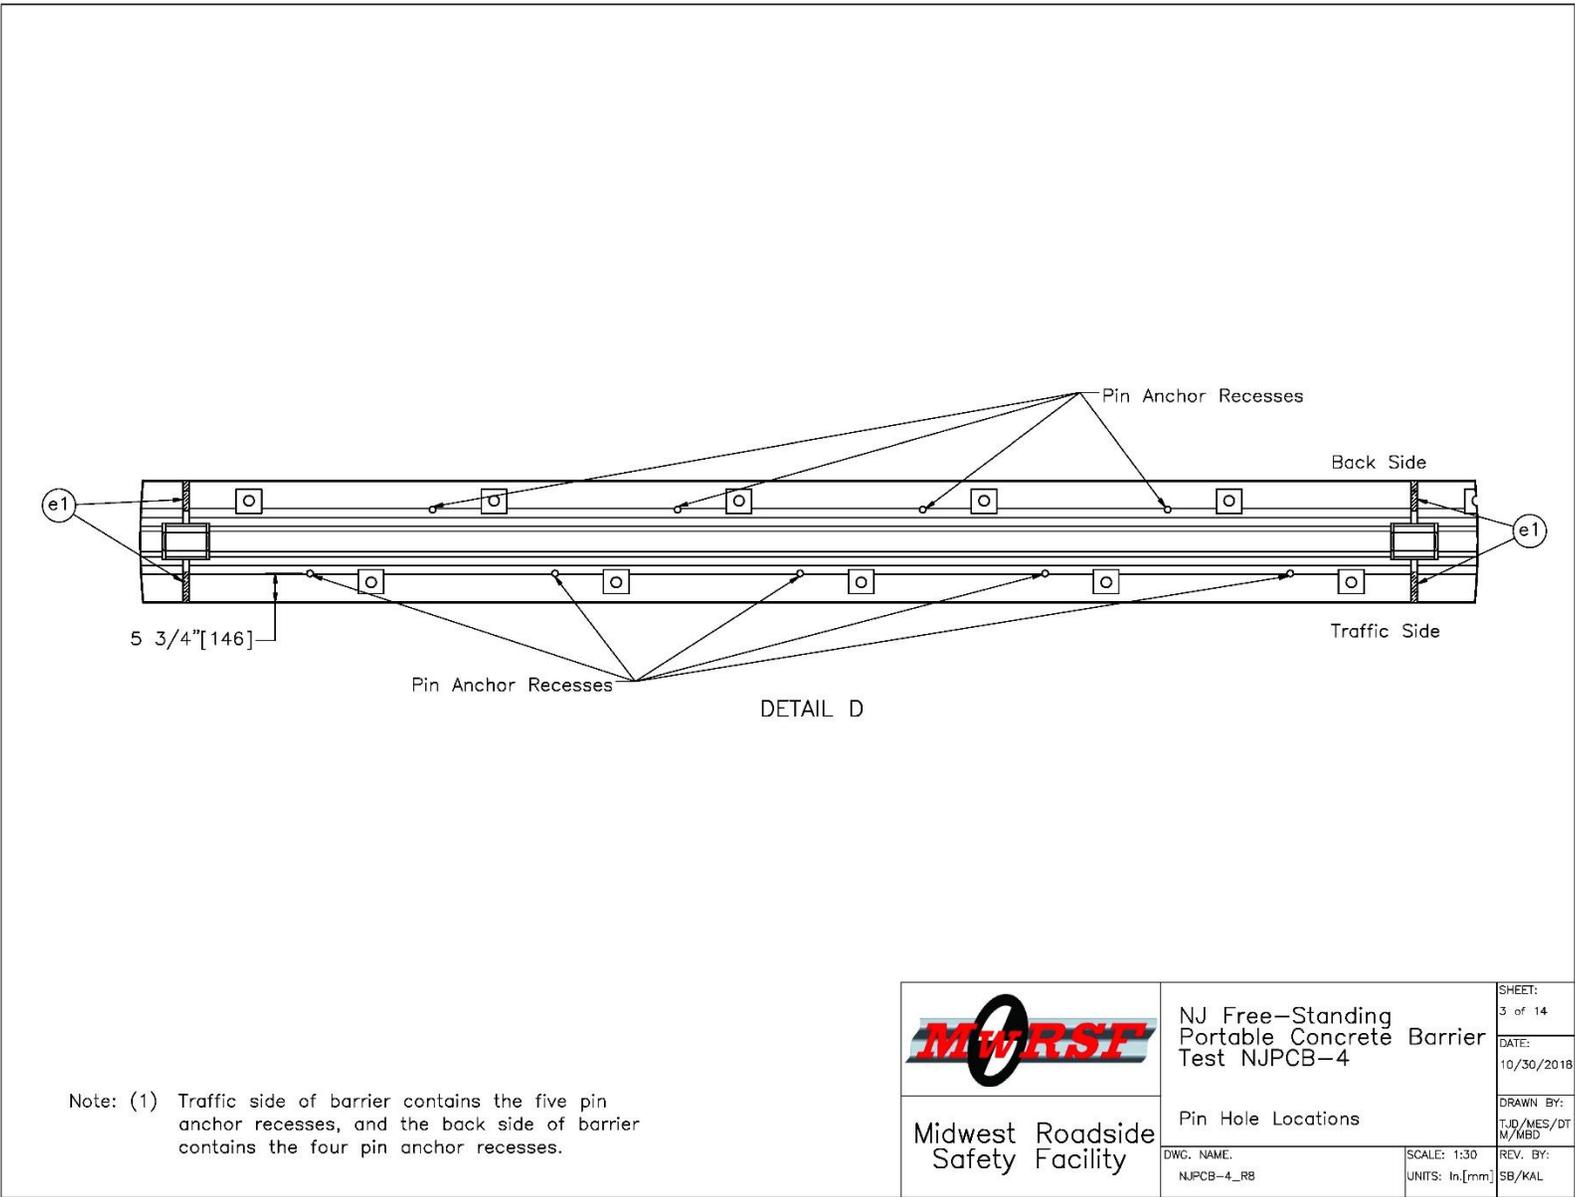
PCB Pin Anchor Recess Locations, Test No. NJPCB-4
